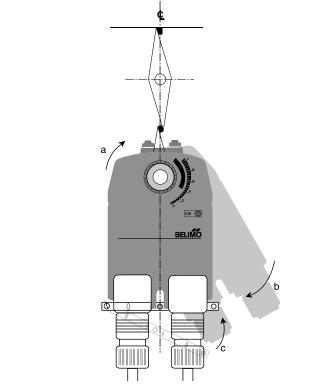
FIGURE D - Standard Mounting (Dimensions in Inches [mm])
